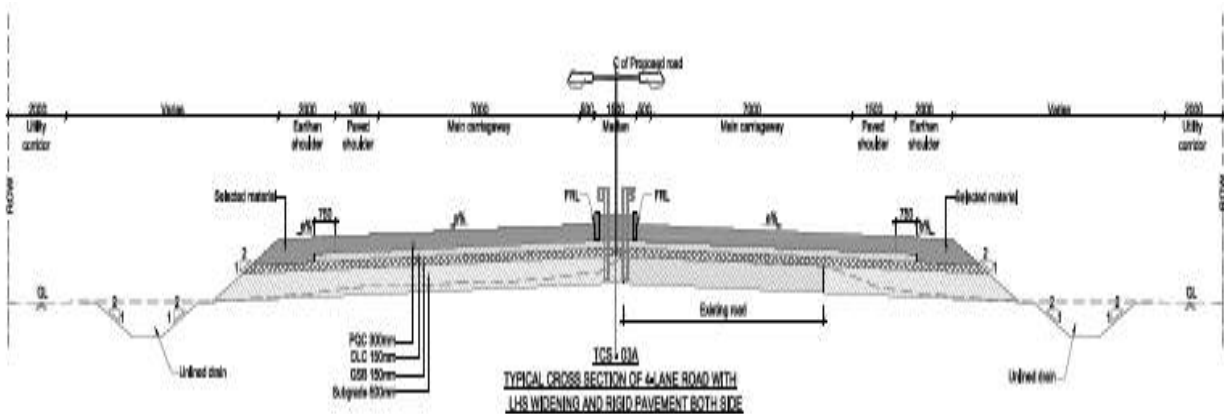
TCS-3A 4-lane road with concentric widening and rigid pavement both side
